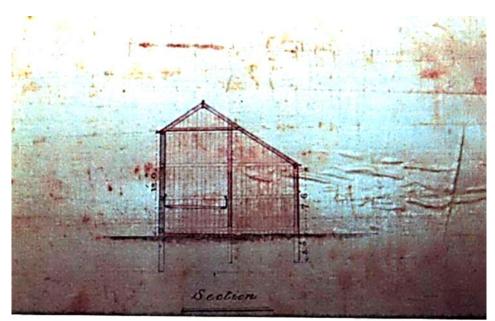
Orange Courthouse Barnet design 1881/3 – Detail Stables Section. Source: AONSW Plan 834 in Mider, 1998
